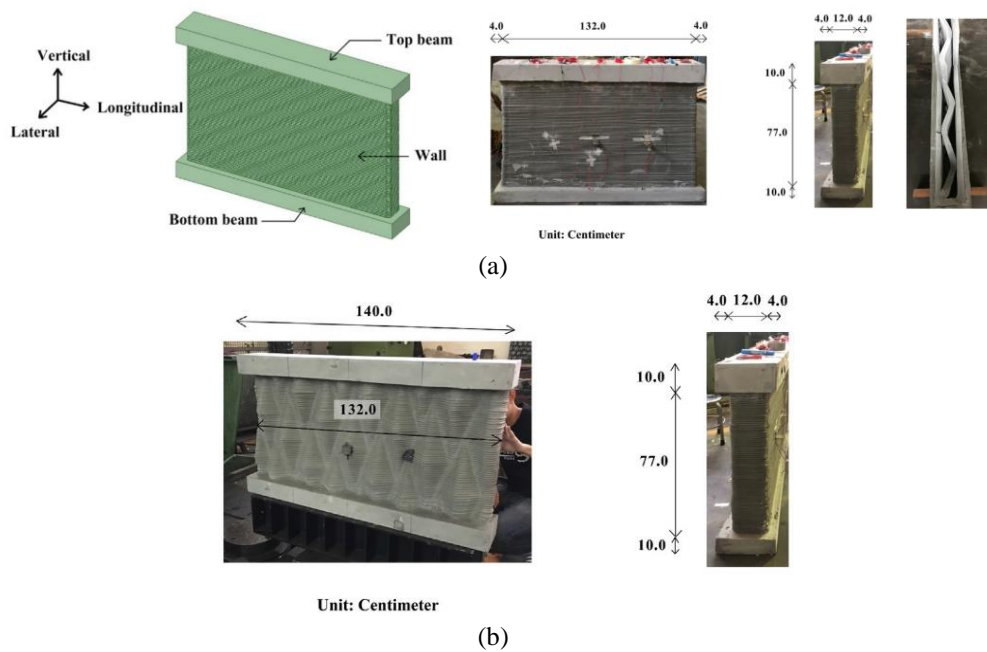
The Used Wall Samples; (a) The Flat Wall, (b) The Diamond Wall [34]
